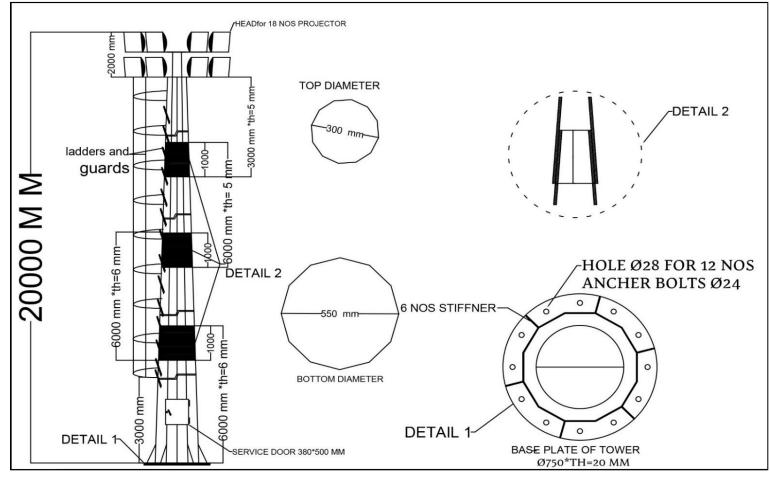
Implementation Plan for the Foundation of the Light Tower - Page 9
